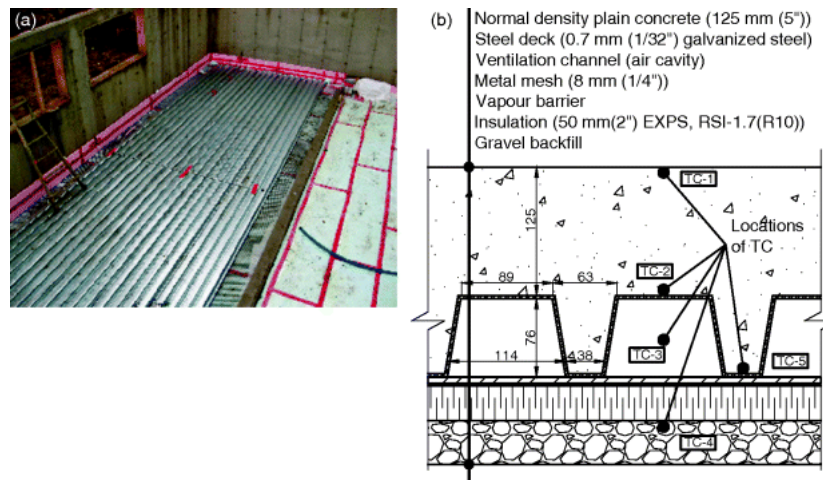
Basement ventilated concrete slab: (a) prior to concrete being poured (left side) and under-steel-decking (right side of photo); (b) cross-section of VCS (right)
